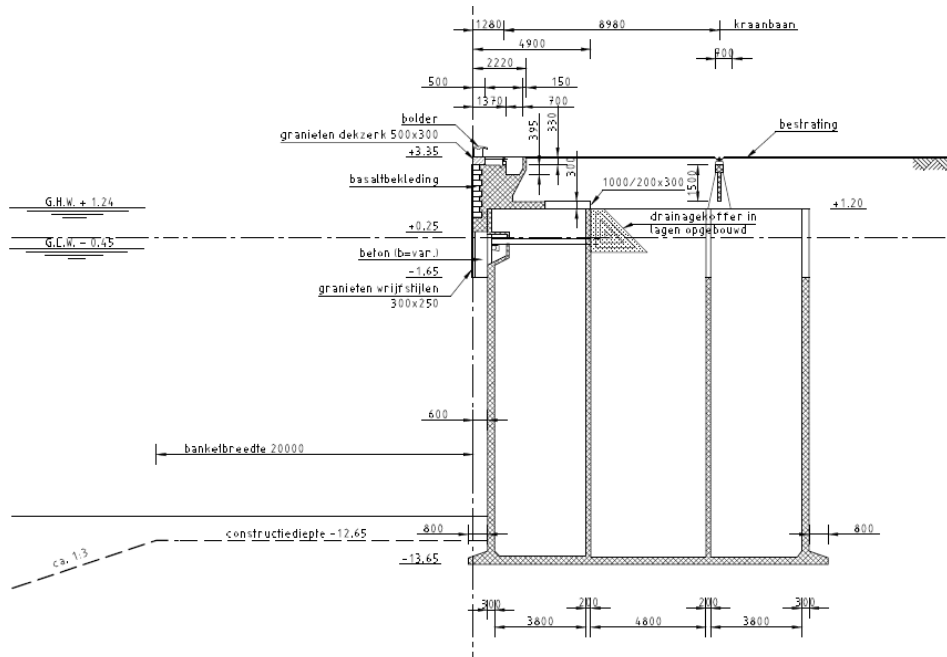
Detailed cross-section of the caisson used as quay wall at the portside of Pier 1 (Port of Rotterdam)
